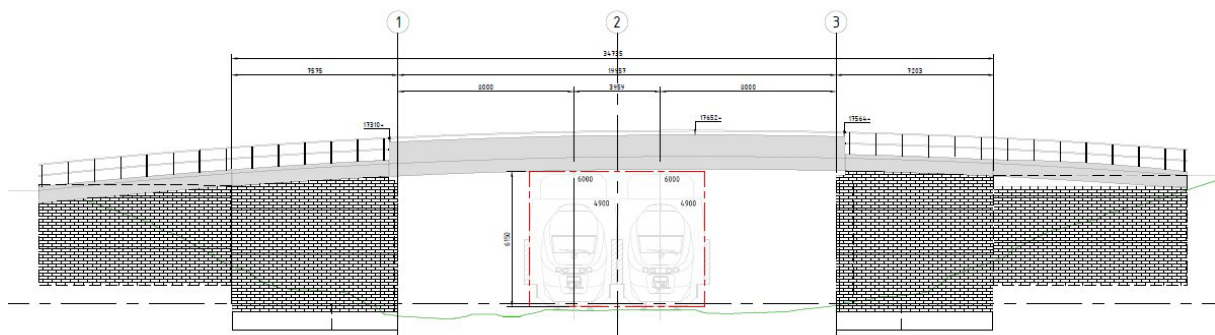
Traditional design to replace the viaduct with a concrete construction (Ingenieursbureau Boorsma, 2019).
